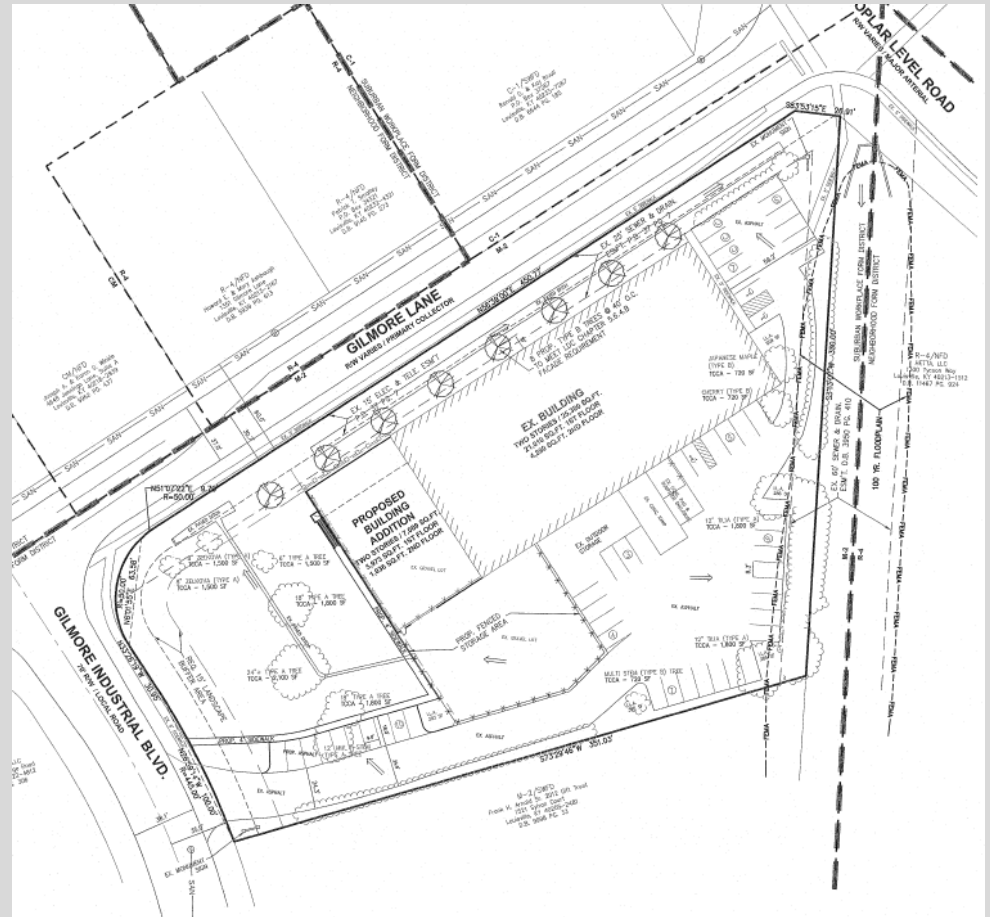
DETAILED DISTRICT DEVELOPMENT PLAN
